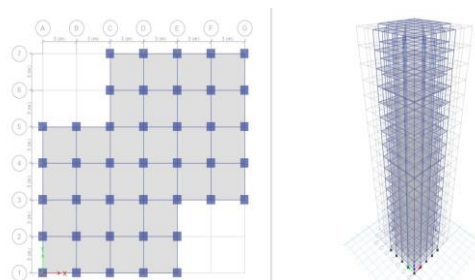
WITHOUT SHEAR WALL FOR IRREGULAR BUILDING
